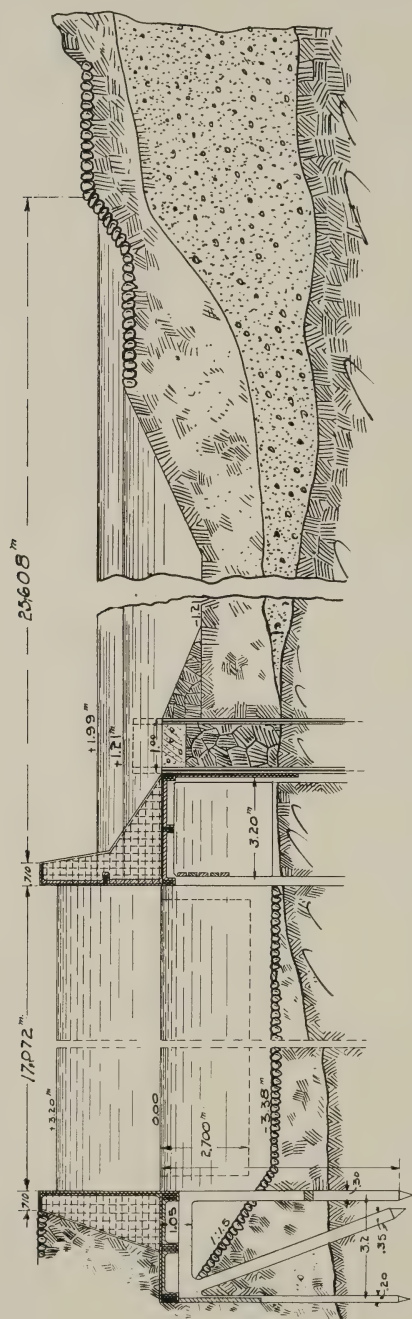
Cross section of reinforced concrete lock at Rybinski, on River Volga, showing saving basin.
